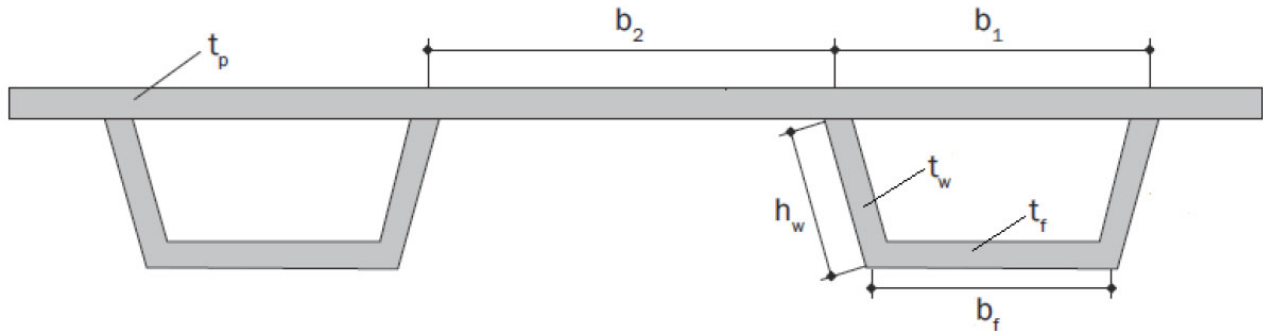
Dimensions of a U-type stiffener cross section (1/7/2024)
